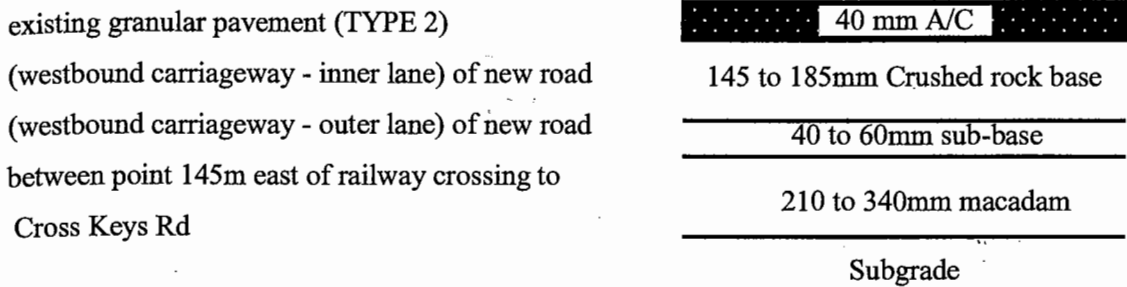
A: PAVEMENT CONFIGURATIONS FOR THE WESTBOUND CARRIAGEWAY OF KINGS RD
